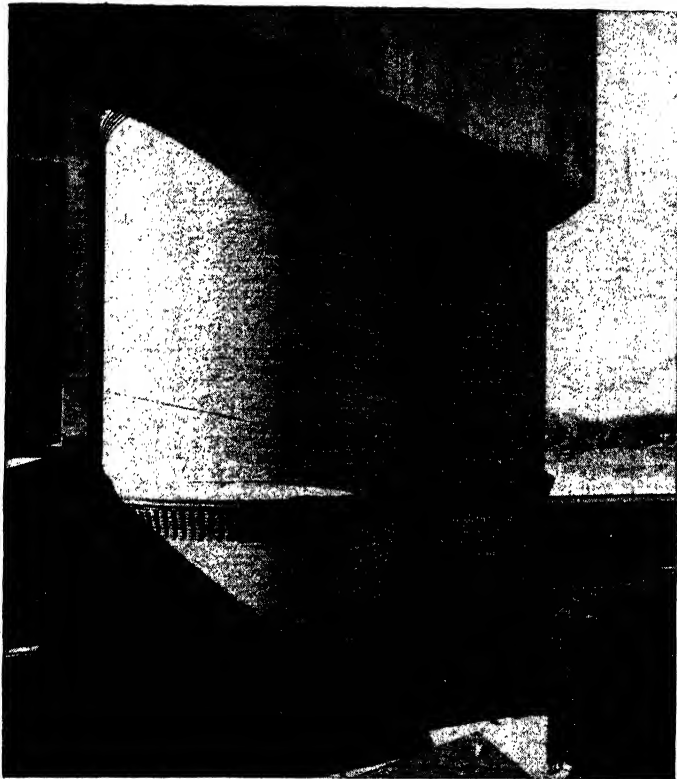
Storage bins, silos, and all circular structures can be simply and economically built with reinforced brickwork. These bins were built by Wedron Silica Company, Wedron, Ill.
